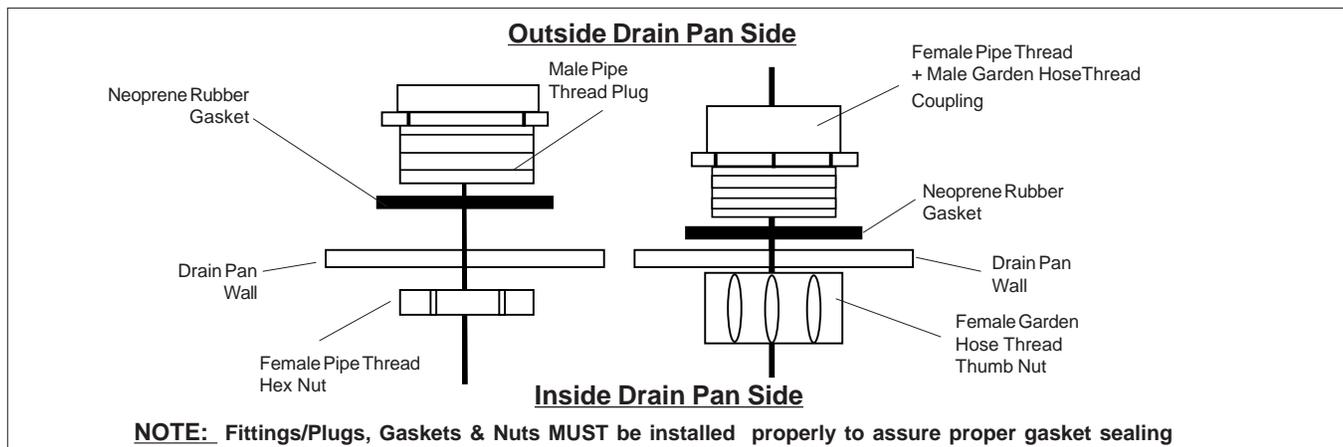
Fitting/Plug, Gasket, Locknut Configuration
